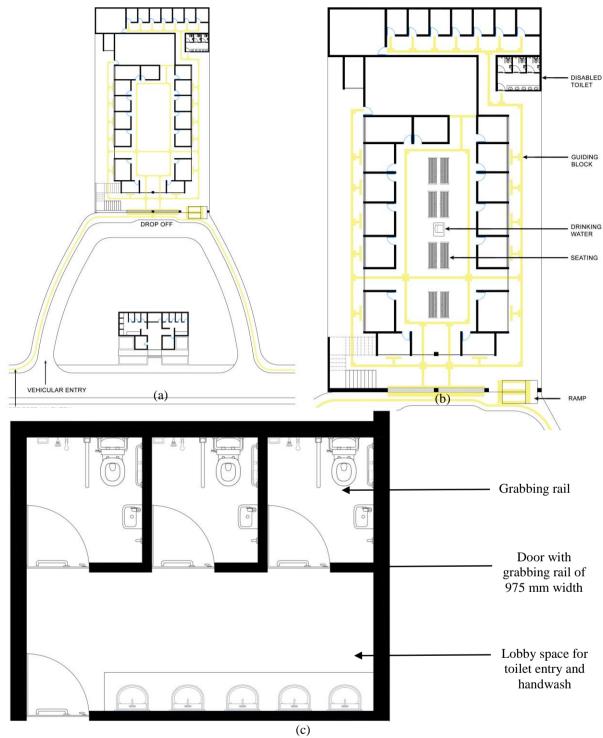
(a) Terminal Building entry, (b) New layout for terminal building, (c) Disabled toilet (prepared by author)
